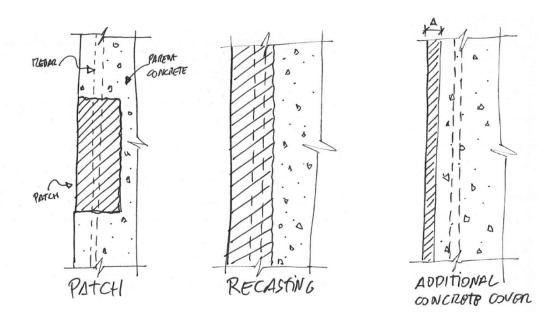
(From left to right) Patch repair, recasting, and additional concrete cover
